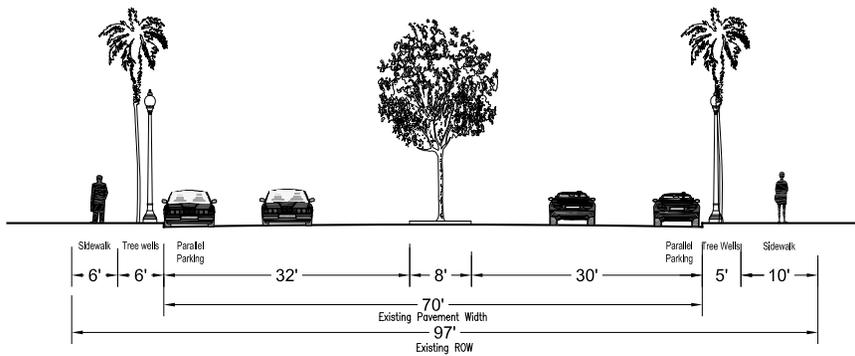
TYPICAL SECTION - SIERRA AVENUE
